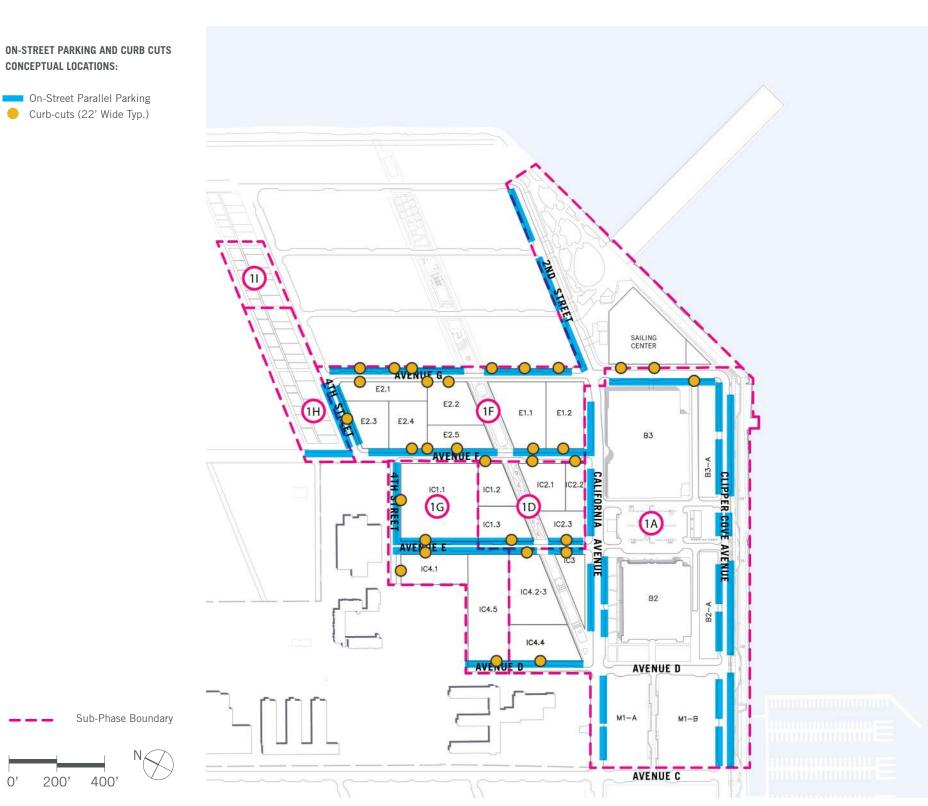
SUB-PHASE ON-STREET PARKING ZONES
